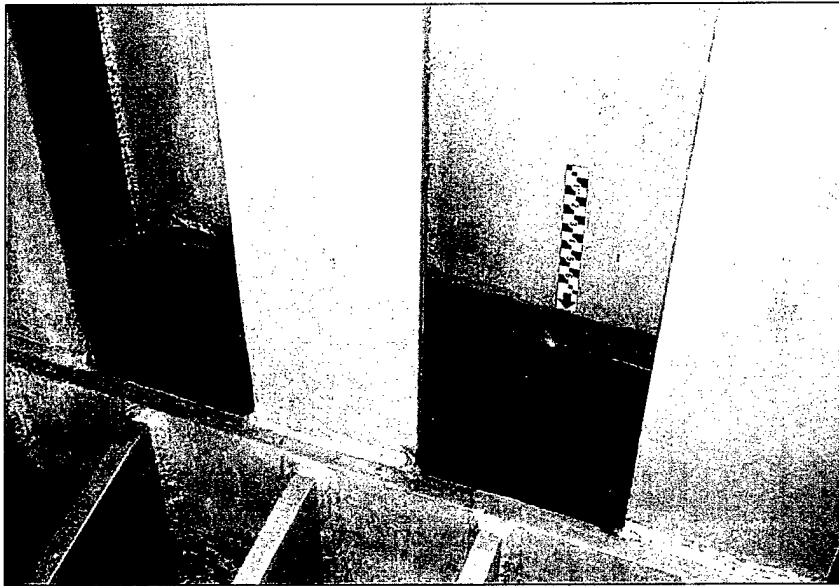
Standing water and debris between purlins, skin plate and upstream horizontal girder flange, typical.
